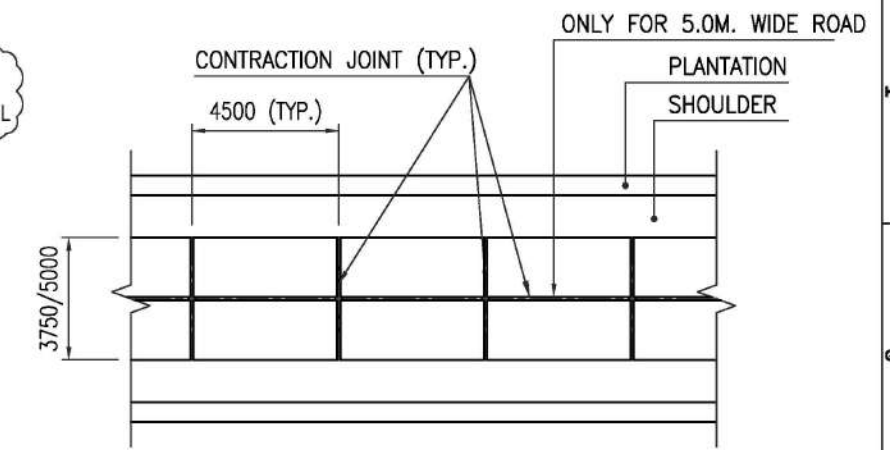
/5.0M. WIDE ROAD AT T-JUNCTION
